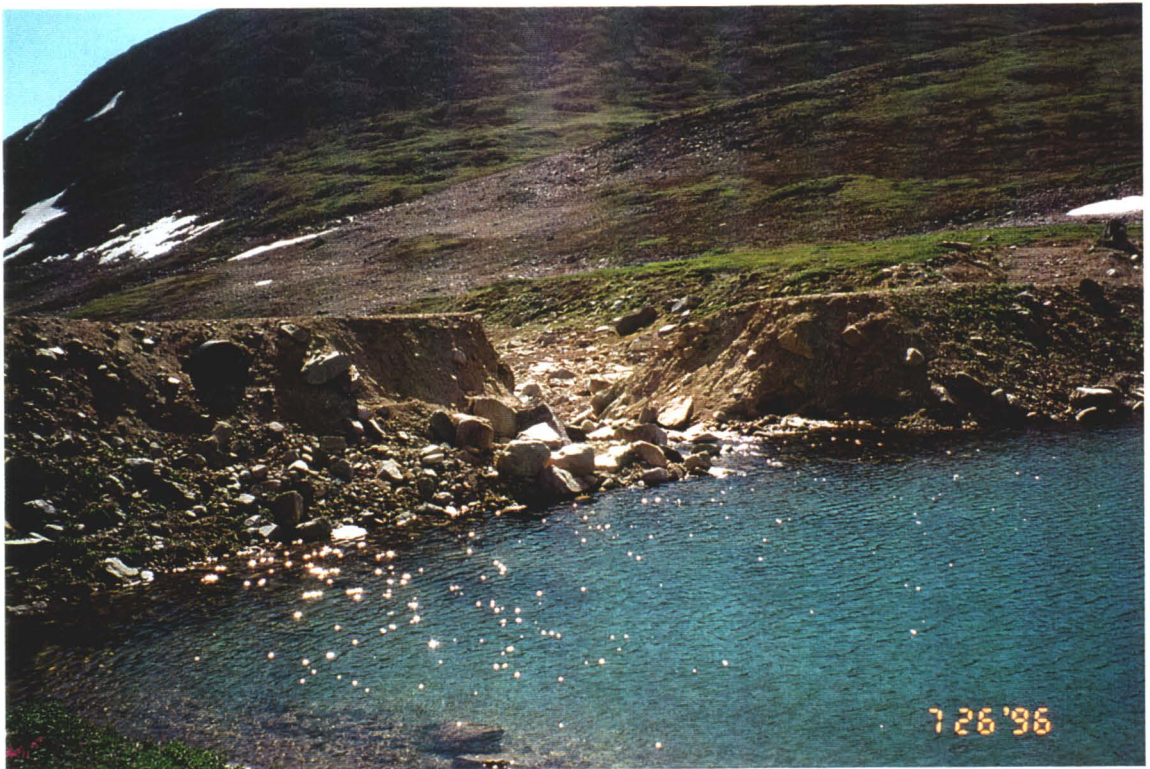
Collapsed Earthen Dam and Water Reservoir on Big Thing Creek
